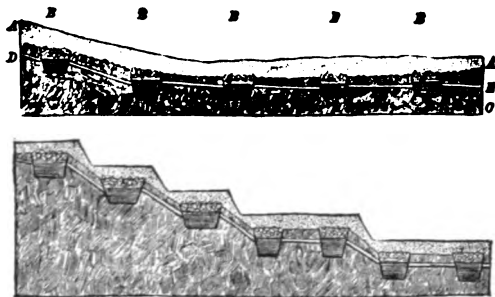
Diagrams of Cole's "New System" of handling soil water. AA, surface soil; B, trenches; C, subsoil; D, overflow trenches; E, outlet or drainage trench. From Cole's "New Agriculture," published by the late Wm. C. Harris.
